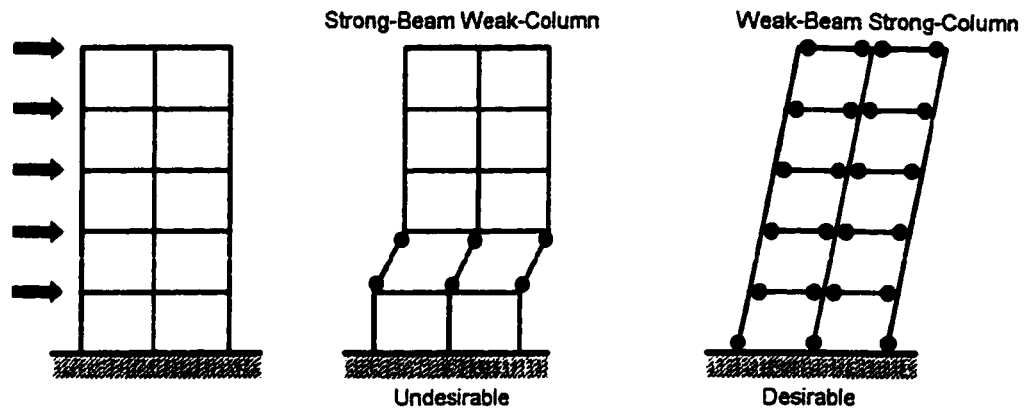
Possible Failure mechanisms for frame structures subjected to lateral forces¹⁵.
